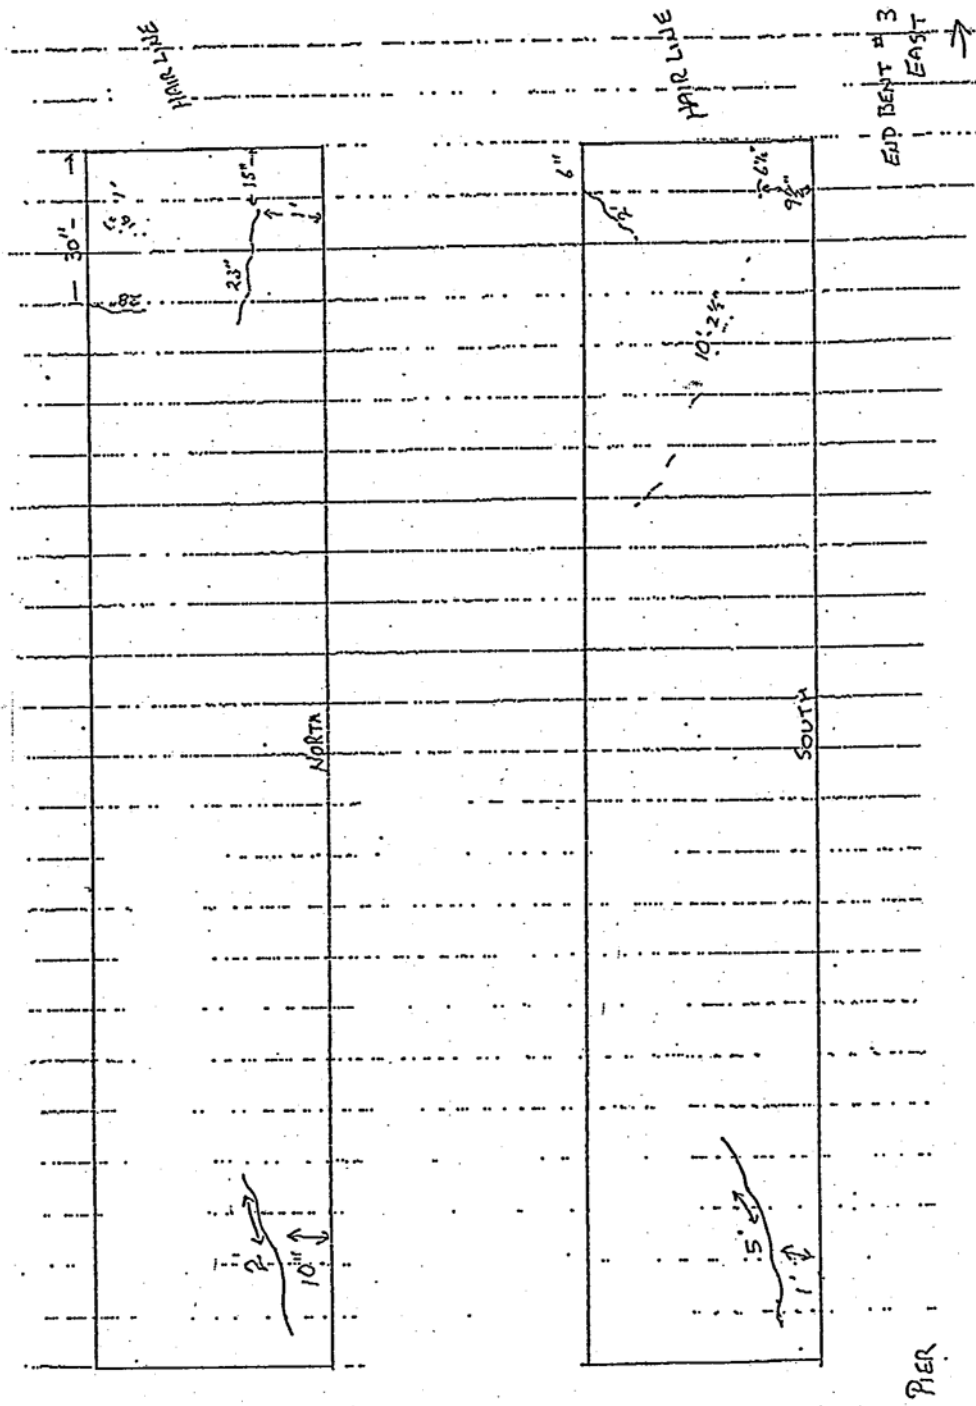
Crack of South Interior Girder over I-75 NB
